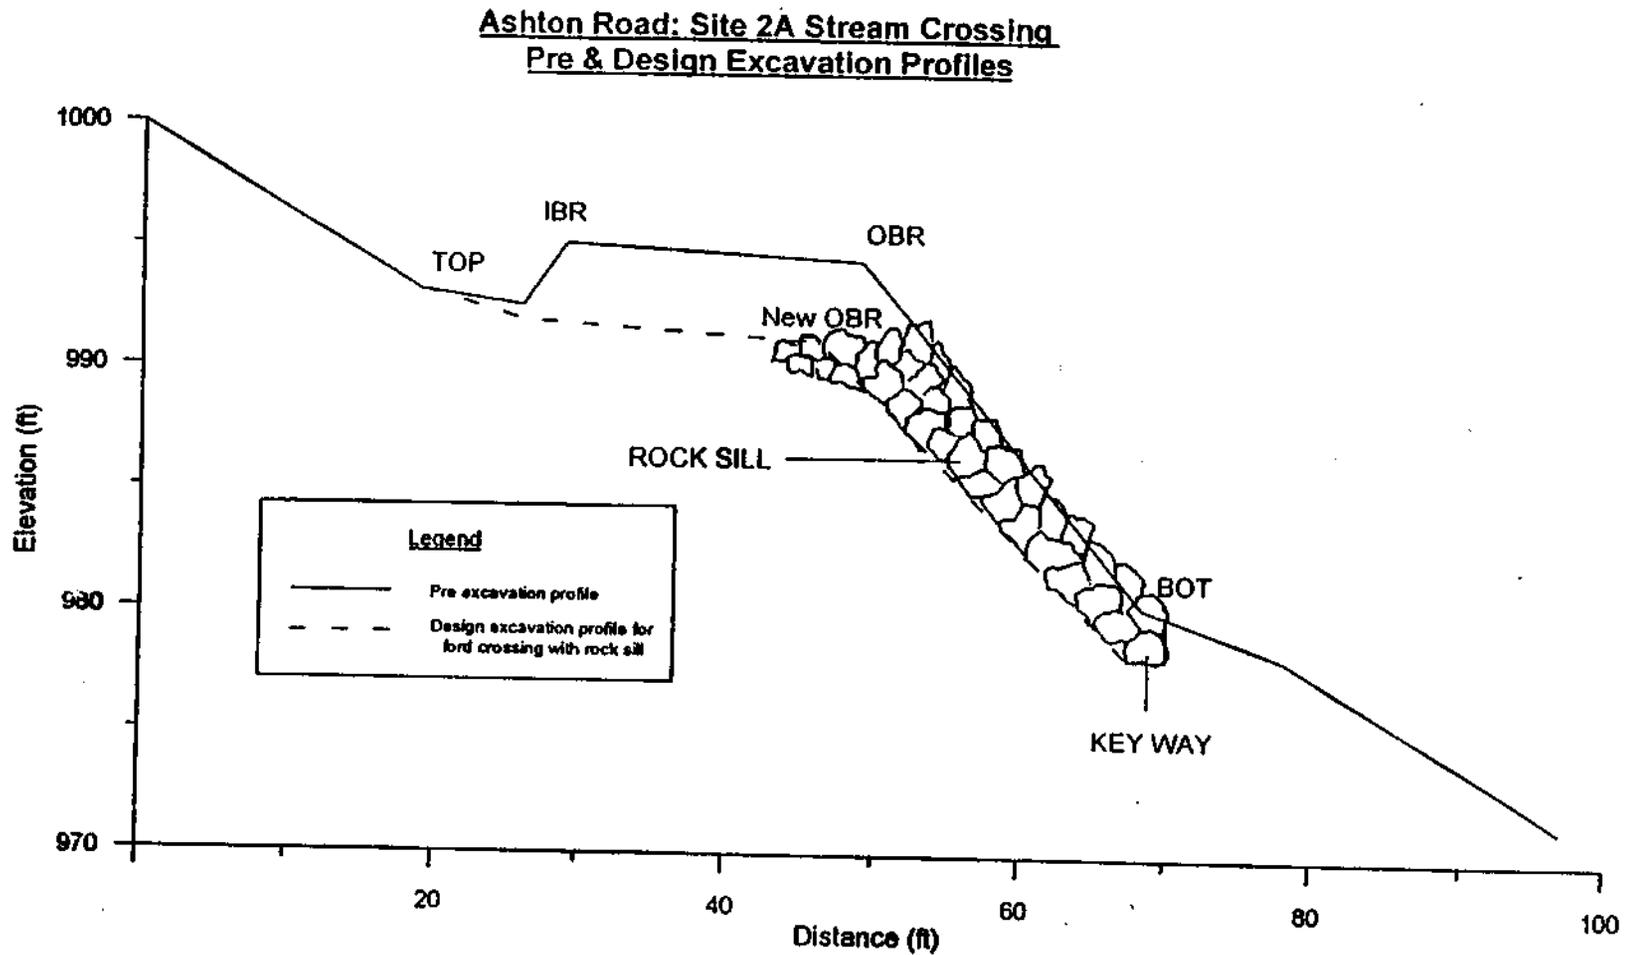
Ashton Road: Site 2A Stream Crossing Pre & Design Excavation Profiles.
